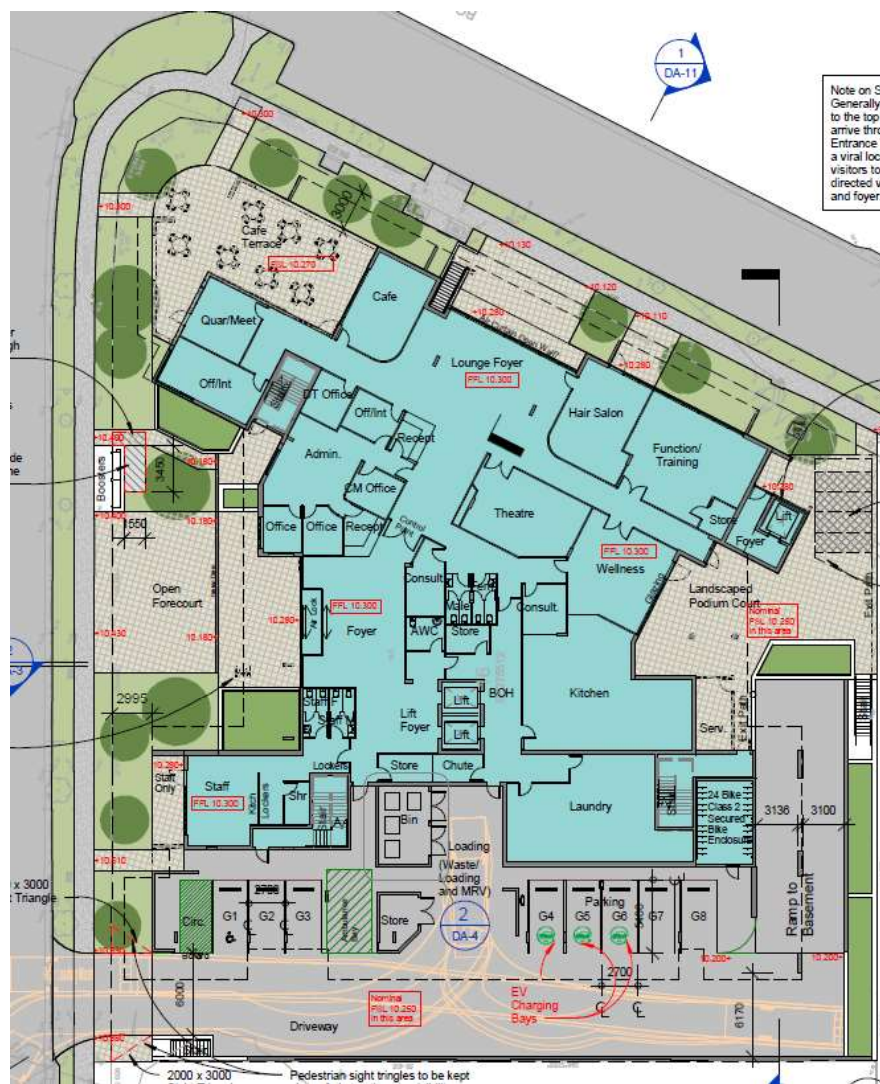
Proposed Ground Floor Plan (Source: GJG Architects)
